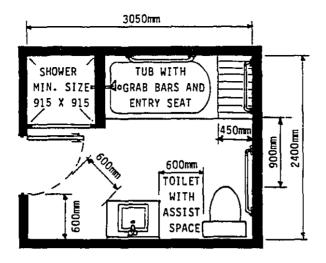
BATHROOM LAYOUT source: Proposed by Author 1990
